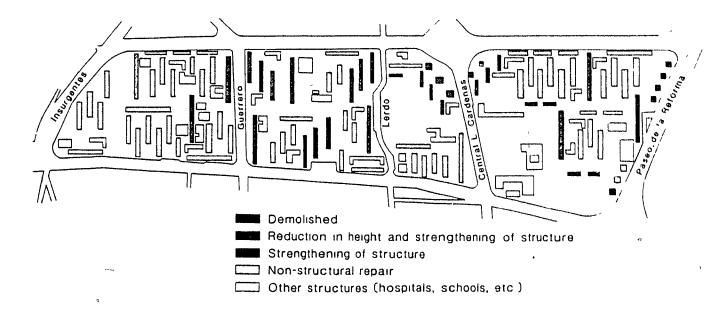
Plan View of Tlatelolco Multi-Storey Apartment Complex.
